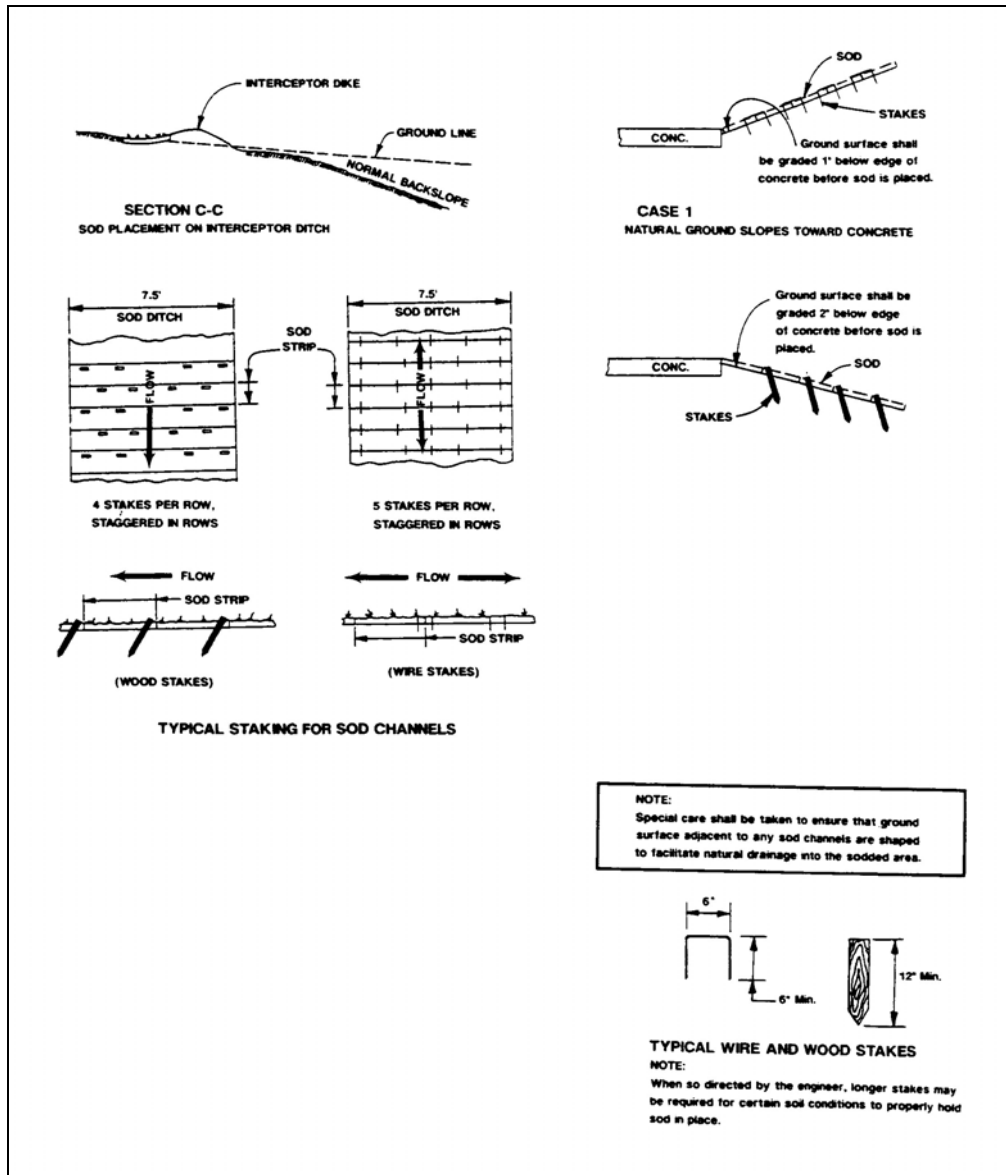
Sod staking (Source: Department of Civil, Construction, and Environmental Engineering, Iowa State University)
